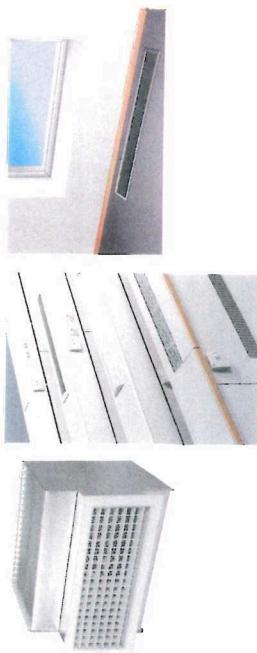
Grille diffusers. Wall, window sill and floor mounted.
